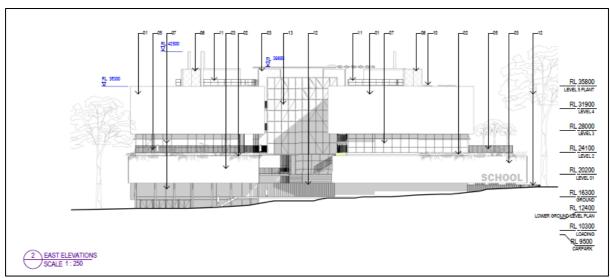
| Eastern elevation of the building facing onto the TAFE entrance off Rhodes Street (Source: Applicant's RRAI 2020)
